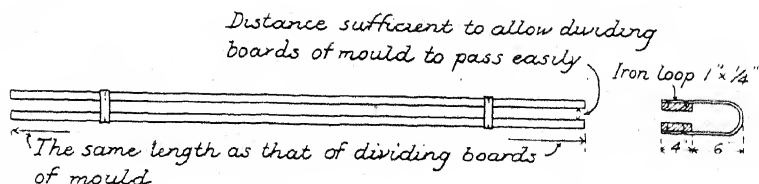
PARALLEL BOARDS USED IN REMOVAL OF MOULD.
